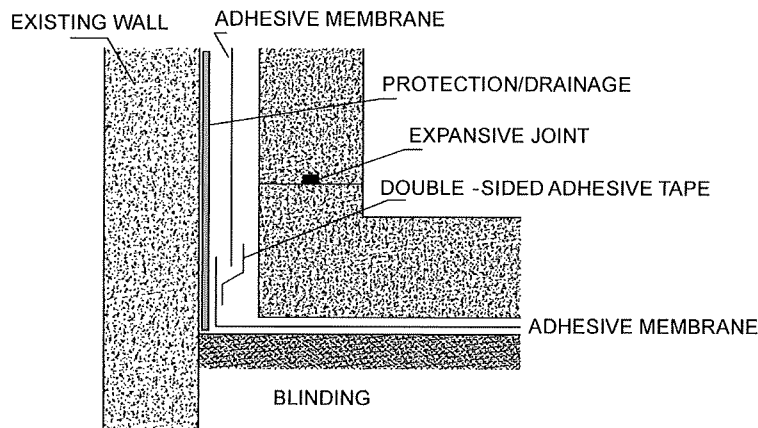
Standard cross-section of adhesive membranes prior to concrete casting
